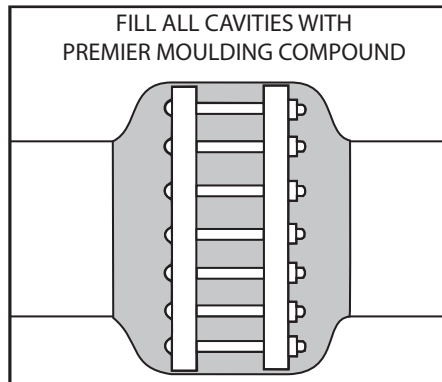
Make sure the mastic is pushed into all crevices and that it forms a smooth profile for wrapping.
